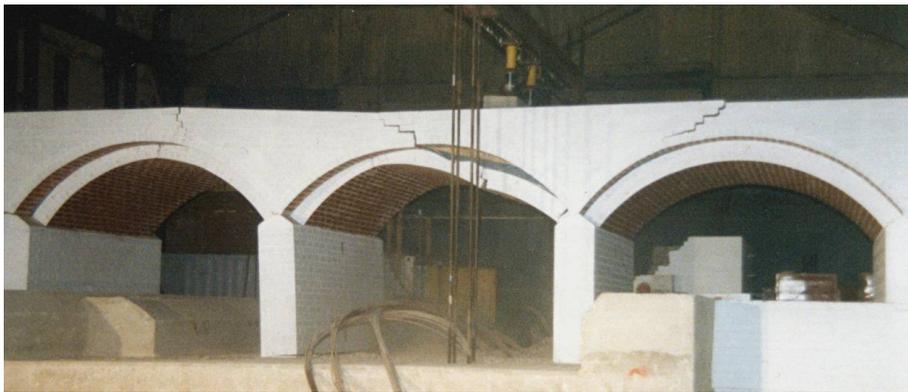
Bolton bridge 'Multi-2' approaching collapse (note that the left and centre spans are involved in the failure mechanism)
